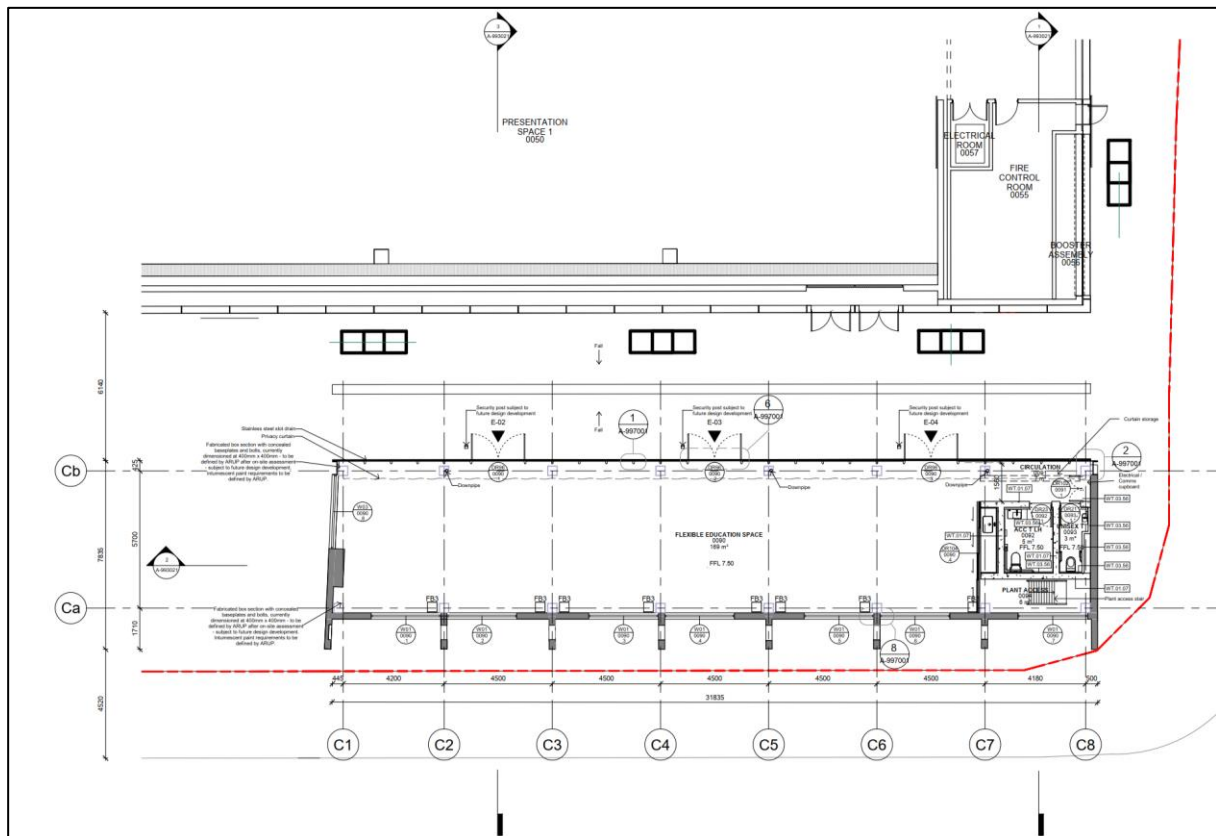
Proposed ground floor plan (Source: Genton, 2021).
